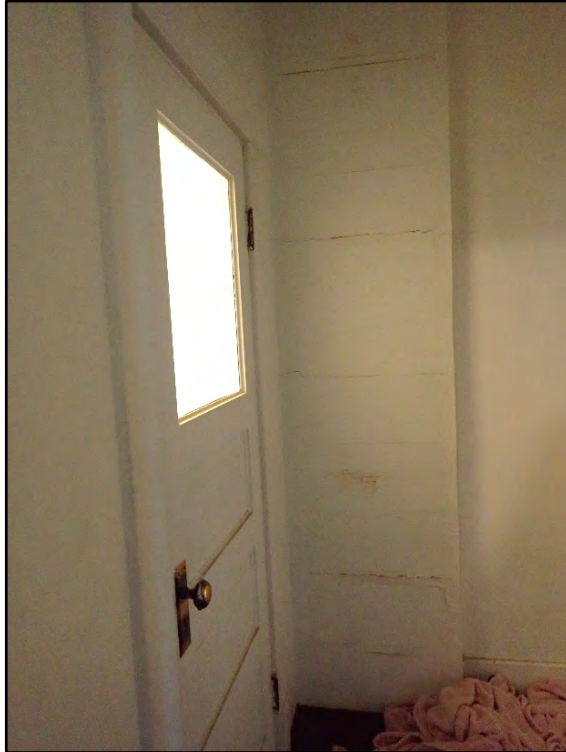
Looking toward the laundry room door from outside the interior bedroom.
